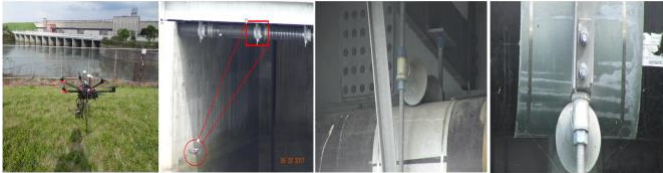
sUAS techniques perform pipeline inspection inaccessible to traditional technique
